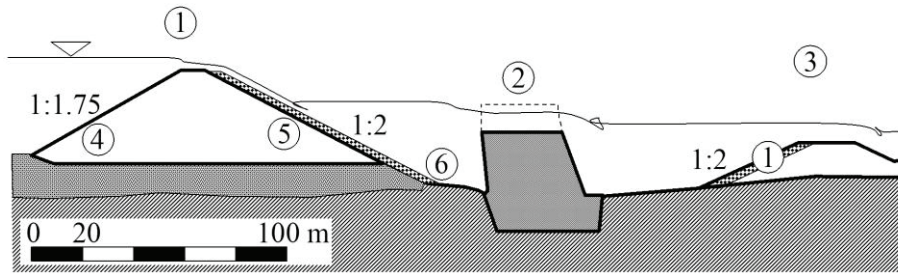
Surface protection using gabions with ① upstream cofferdam, ② dam under construction, ③ downstream cofferdam, ④ riprap, ⑤ surface protection, ⑥ toe of cofferdam (Schleiss 2015)
